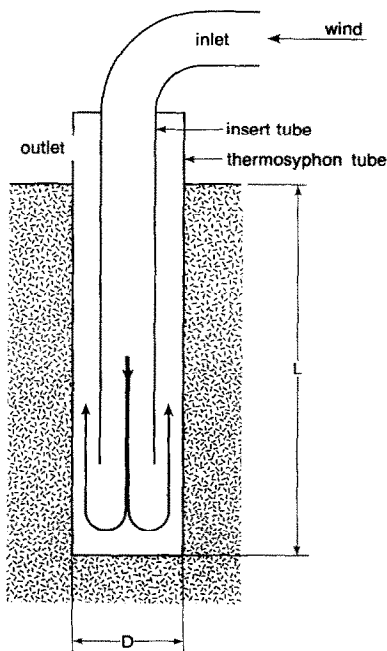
Basic arrangement of wind-augmented thermosyphon tube.
